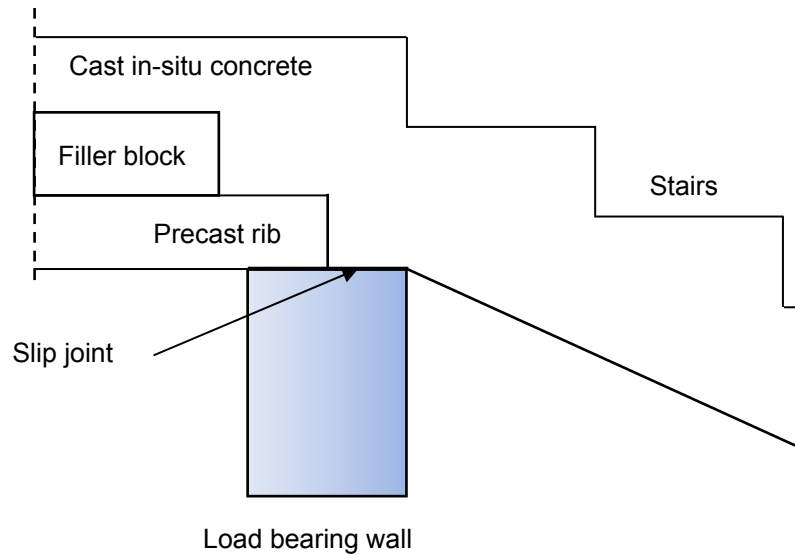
Cast in-situ staircase connecting into a beam and block slab system
